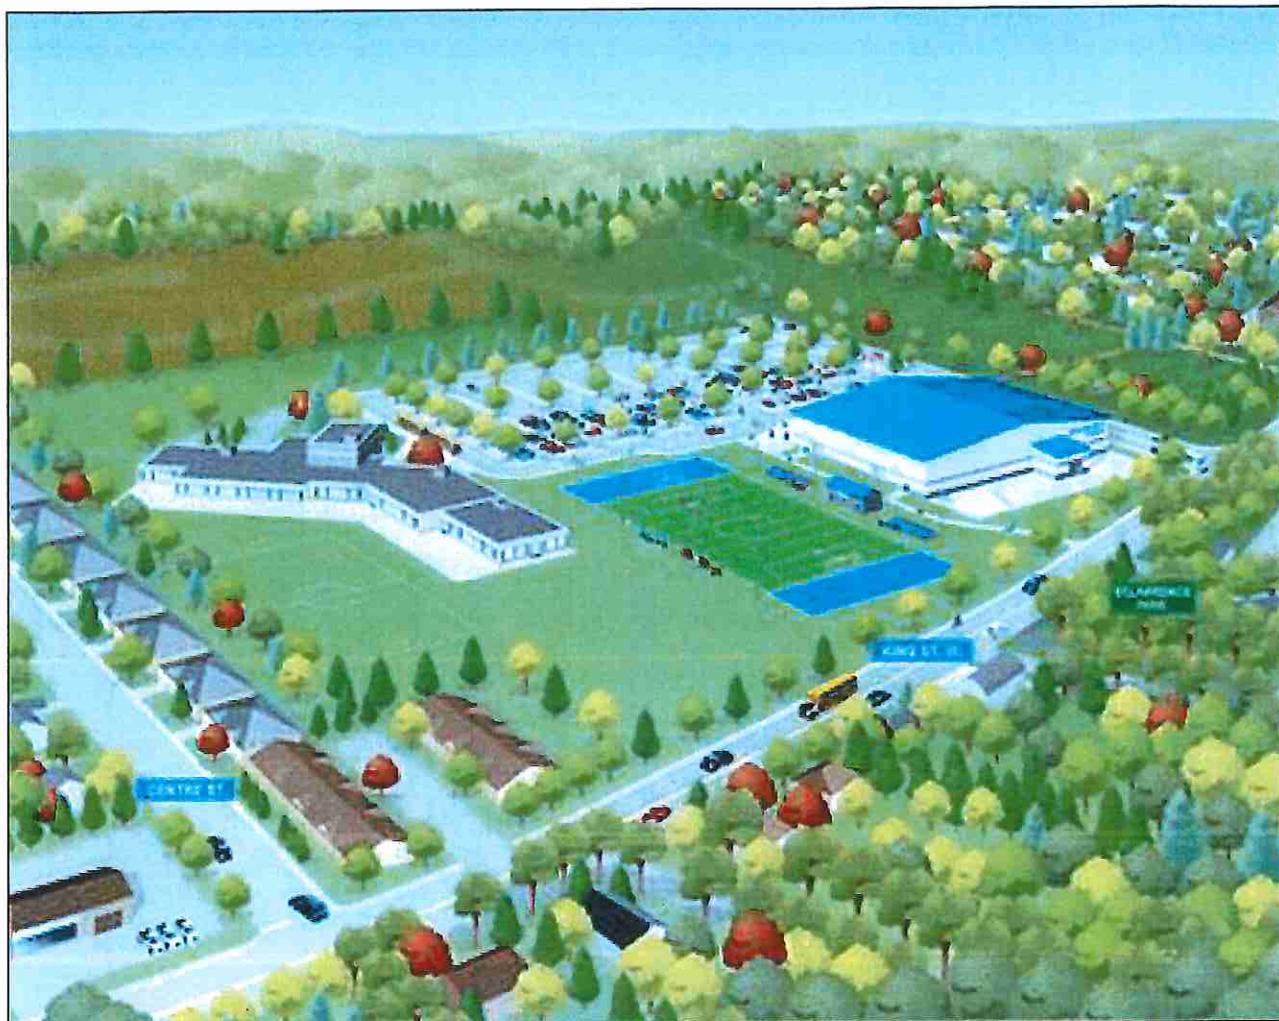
Proposed Elementary School - Looking North from Centre Street and King Street West
